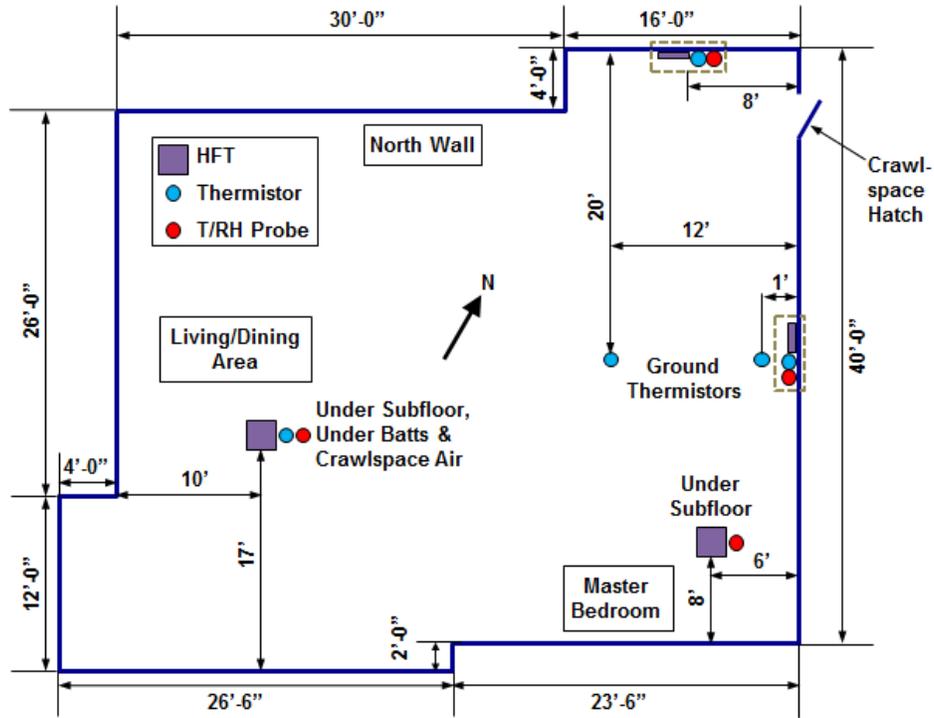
Schematic showing the sensor layout in WC3 crawlspace.
